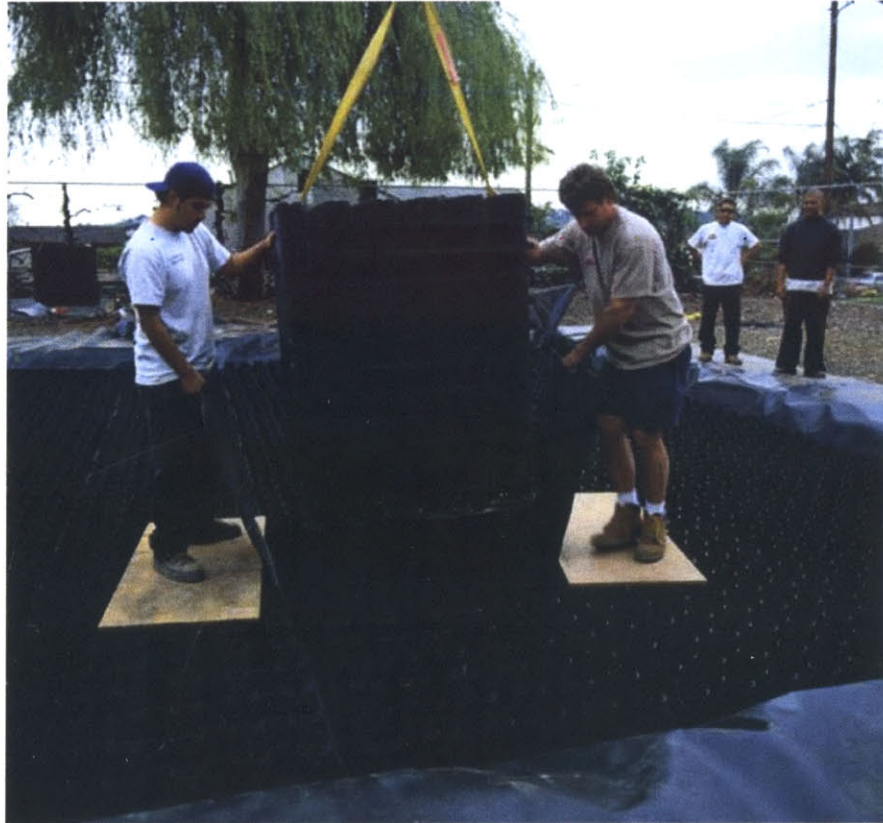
A. Storage - Excavate for sand bed, 40 mil PVC liner, and Rainstore3 units.
